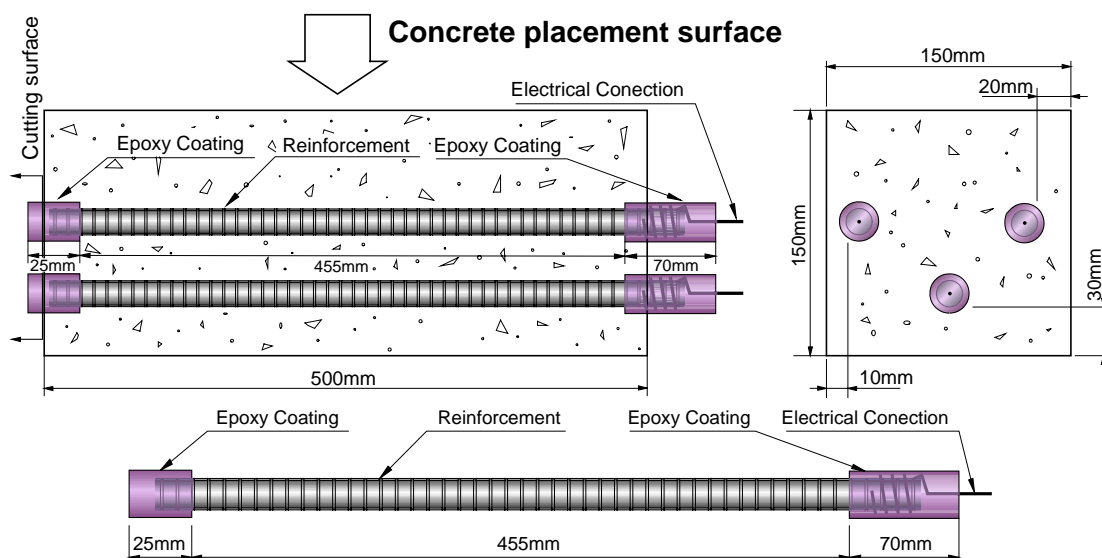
Reinforcing steel bar layout of concrete specimen.
